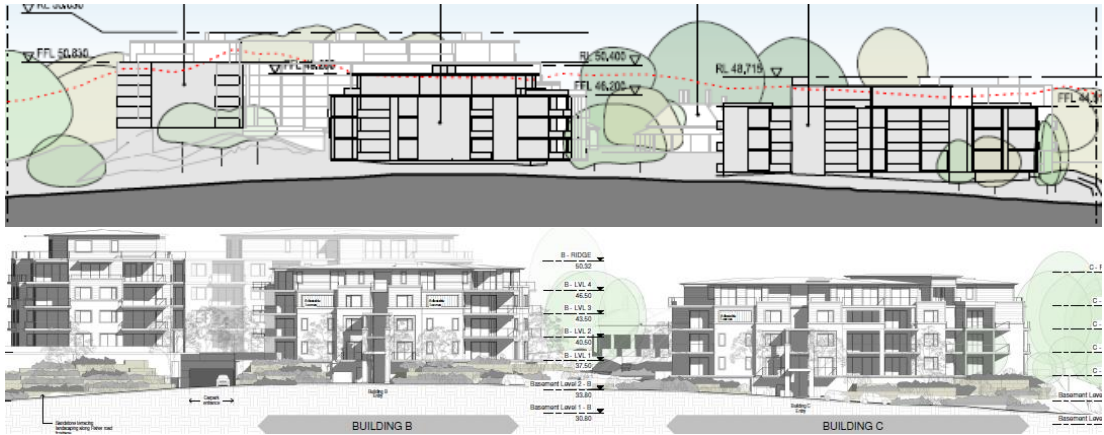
Approved Fisher Road elevation (above) and proposed Fisher Road elevation with sandstone terracing landscaping (below)
